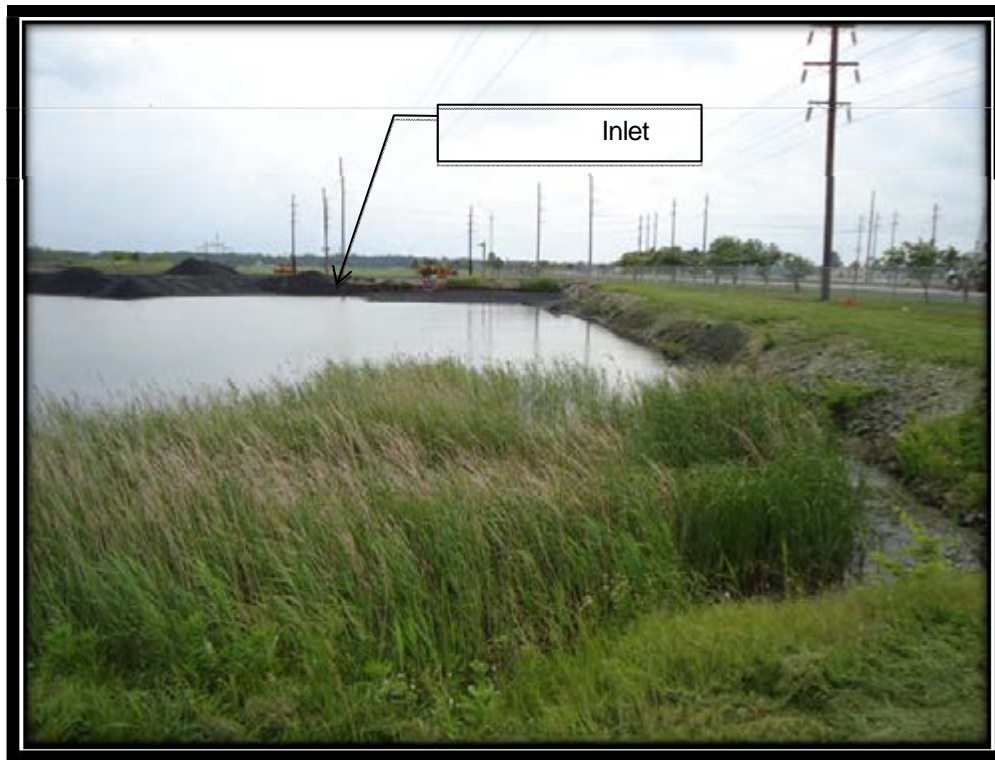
Ash Pond 1 General Conditions Photograph (Note Inlet Sluice Pipe)
